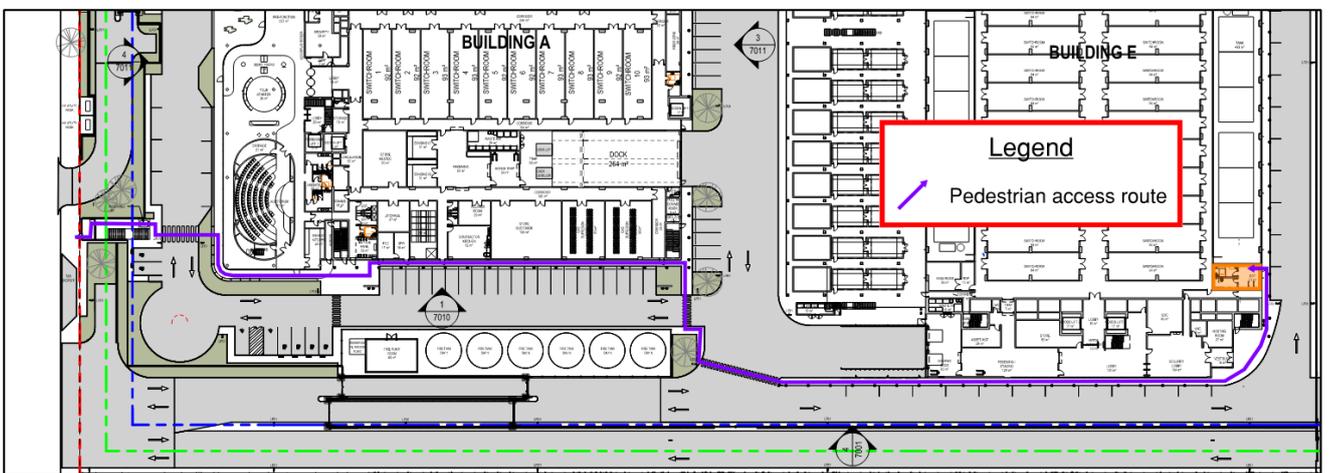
Building E – Proposed End of Trip Facilities and Pedestrian Access
